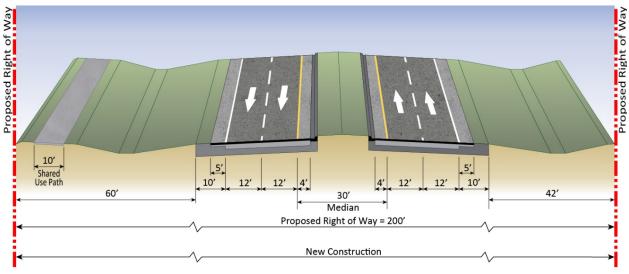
SR 29 Bypass Typical Section from Gopher Ridge Road to SR 29 (Central Alternative #2)
